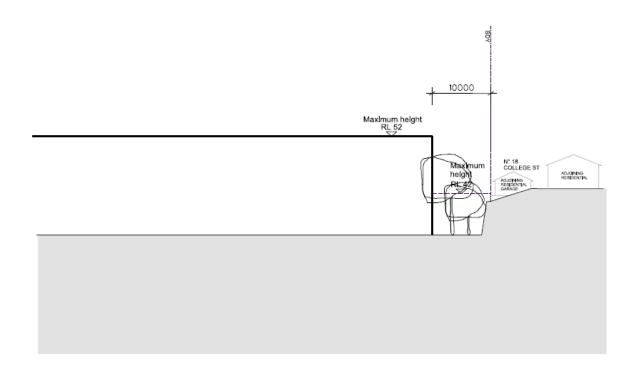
Section C Setbacks to neighbouring residential property at 18 College Street
